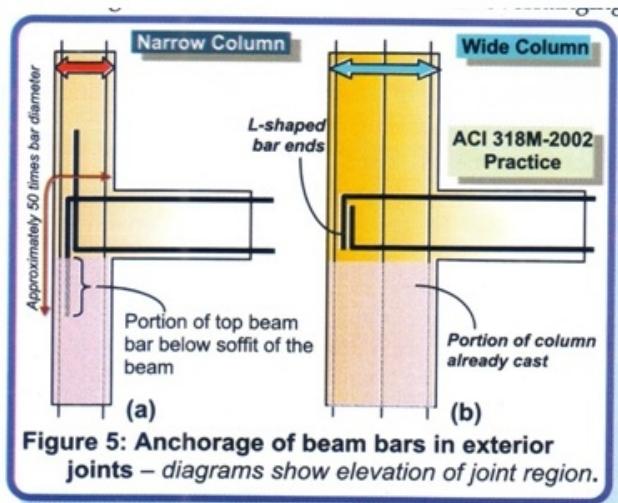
Anchorage of beam bars in exterior joints – diagrams show elevation of joint region.
